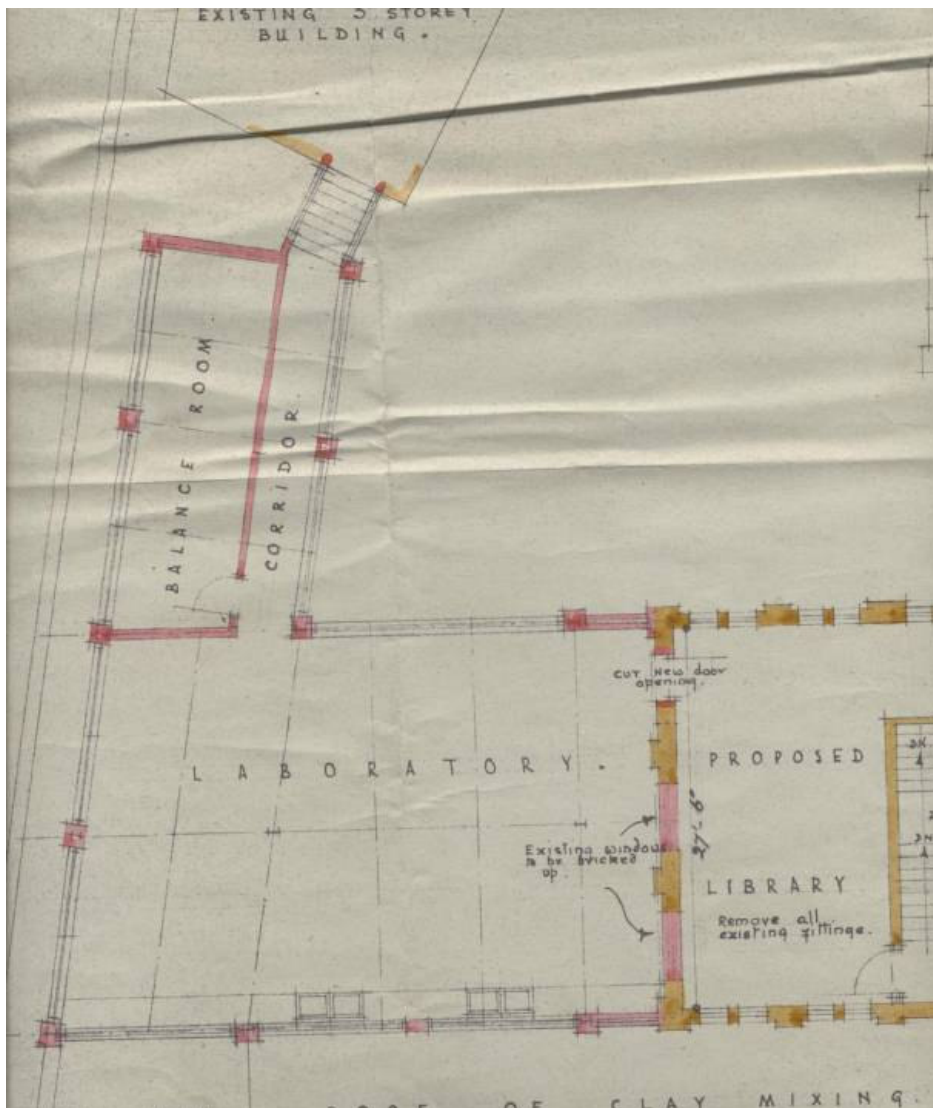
Plans for the first floor of Building C1. This shows the laboratory running over the top of Prince's Drive and joining Building B. The spur onto Building F (top left) was modified so that the corridor ran to the east side through the proposed Balance Room (source: Worcester Porcelain Museum Sam N Cooke December 1942 number WP4/9).
